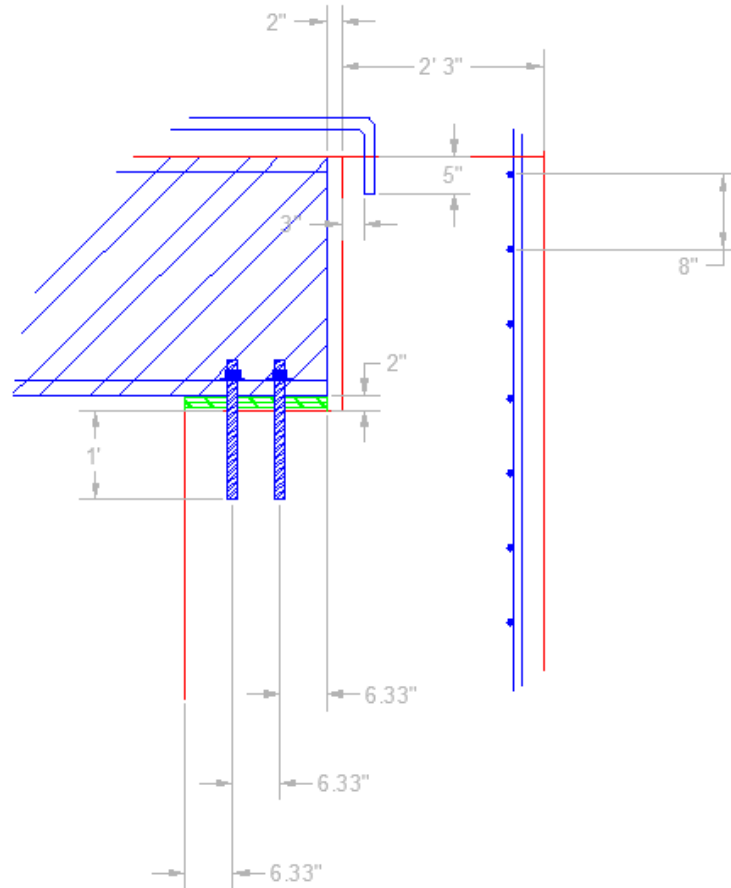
Drawing Number #7: Top of Retaining Wall Abutment Design
